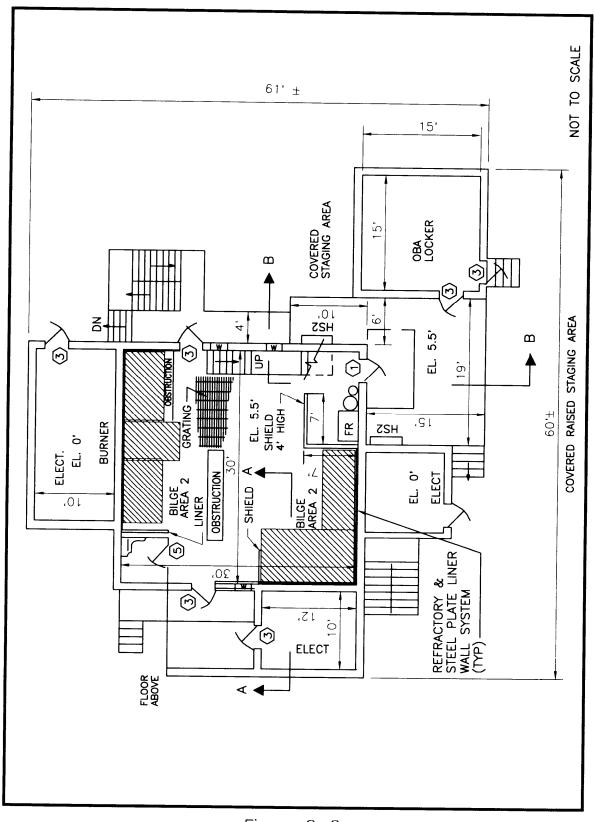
19F3/19F3B B-1 First Floor Plan 167
